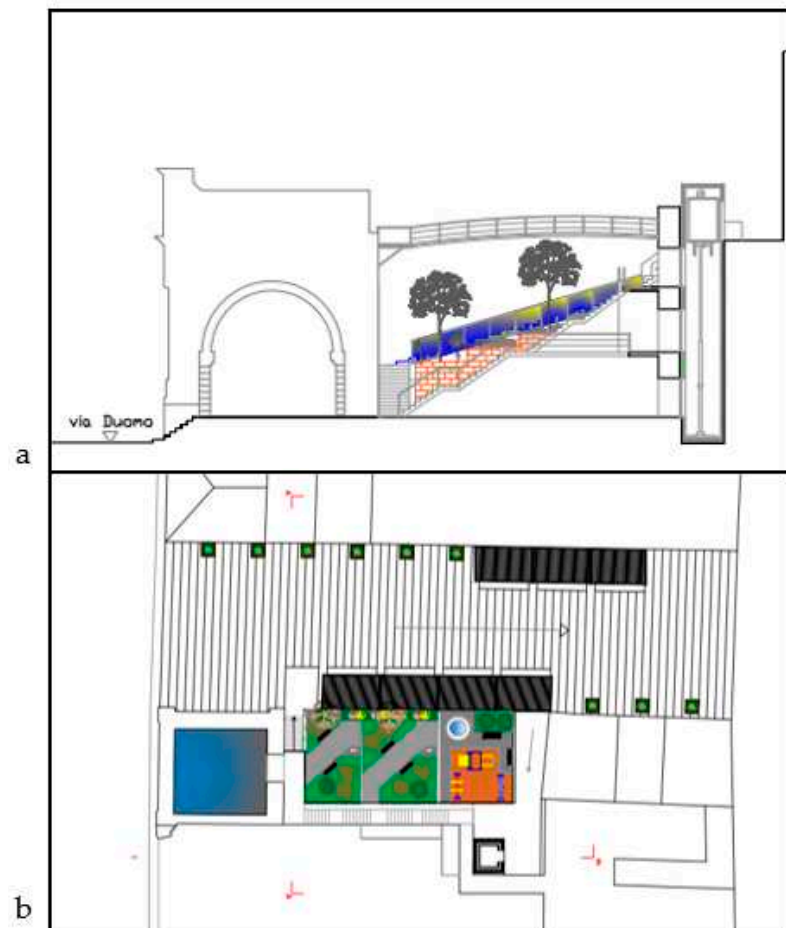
Architectural drawings of preliminary renovation design. (a) section; (b) plan.
